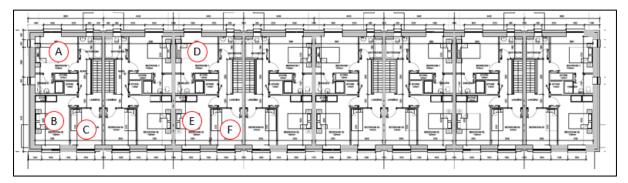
Blocks B5 – Second Floor Assessed Rooms
